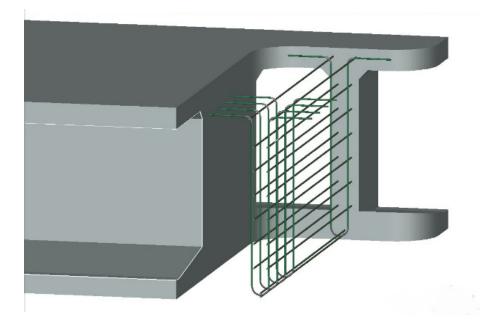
Integral Bent Cap Girder Reinforcement
